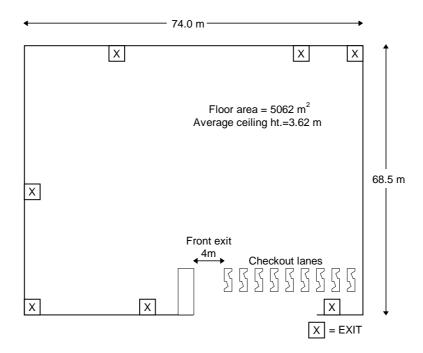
FLOOR LAYOUT FOR SINGLE LEVEL MAJOR STORE
